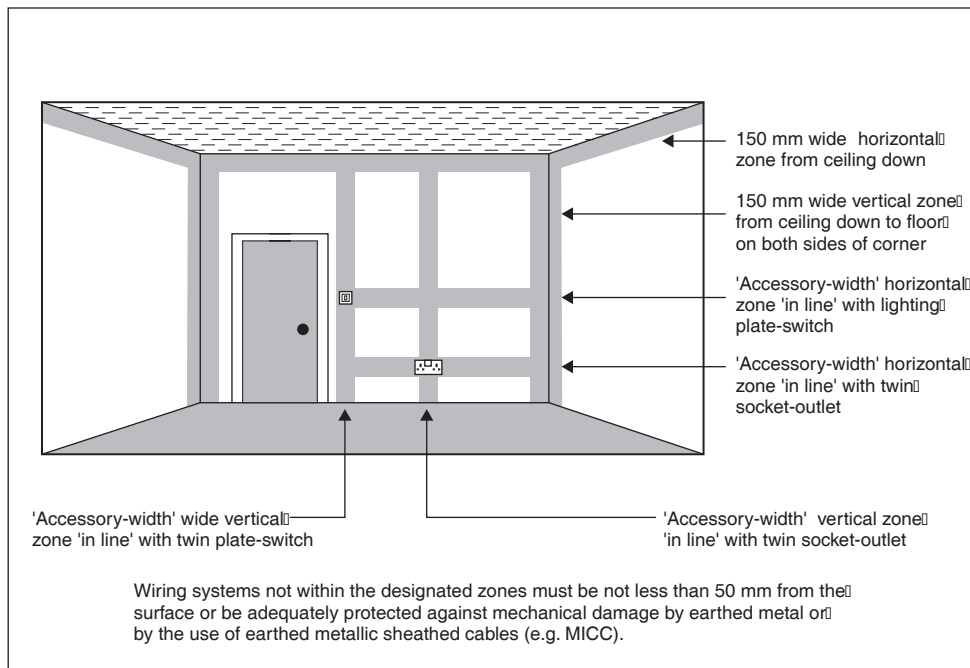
'Safe' zones for mechanically unprotected non-metallic wiring systems
